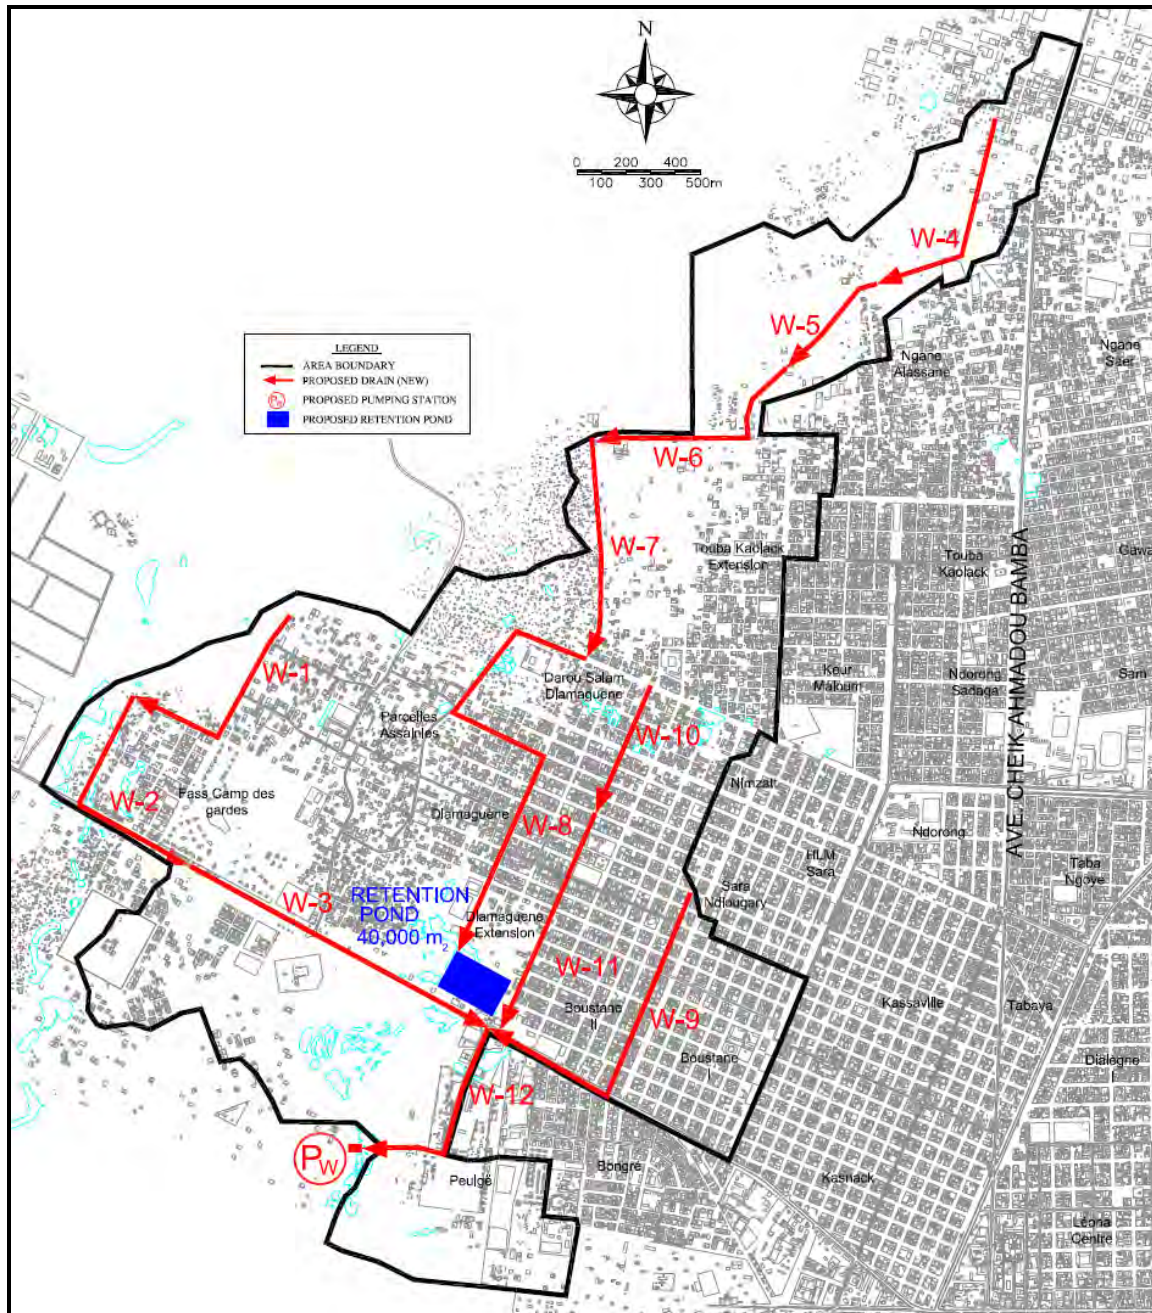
Location of Proposed Drainage Facilities for West Area
